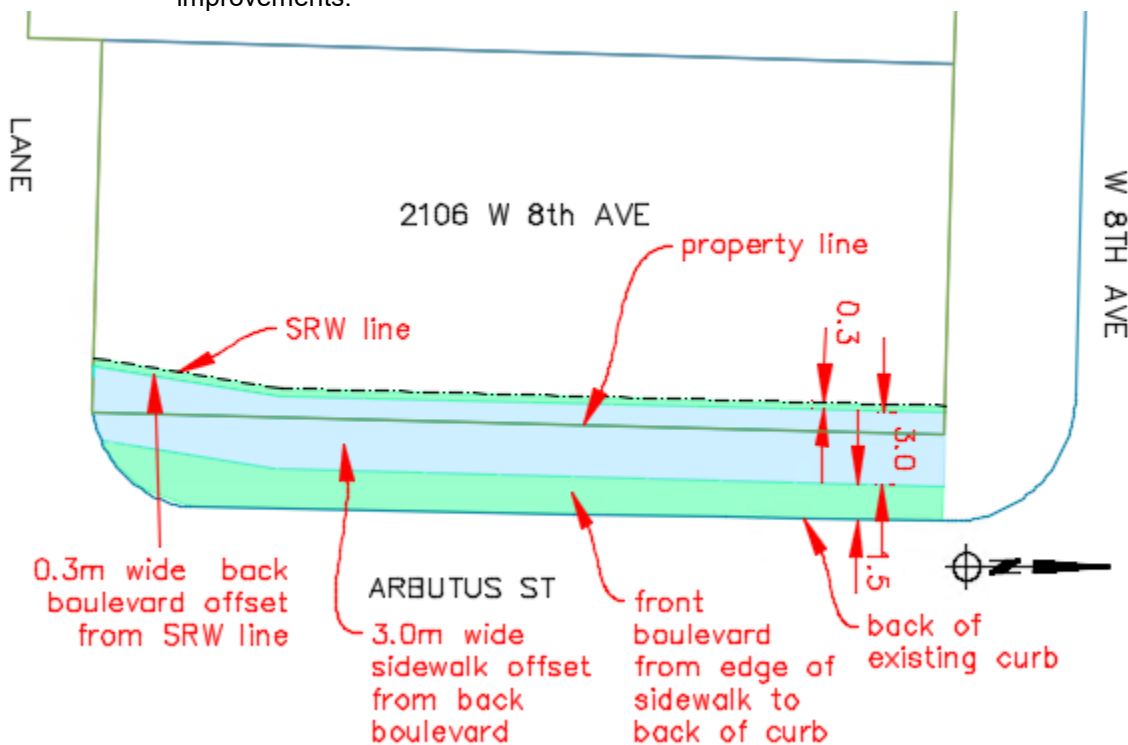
Explanatory plan indicating the requirements of Condition A.2.1 a, b, and c.
